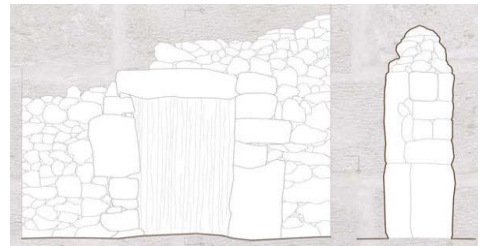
Dry stone wall with boulders and shapeless stones (Source: Caleca, 2018)
